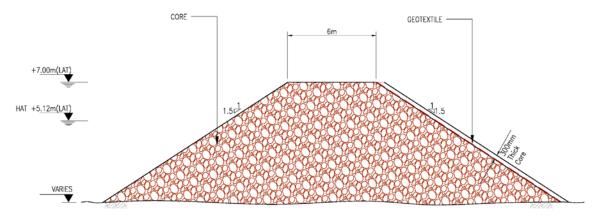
Western Basin Expansion typical section of bund wall – core and geotextile (bund wall type B2)
